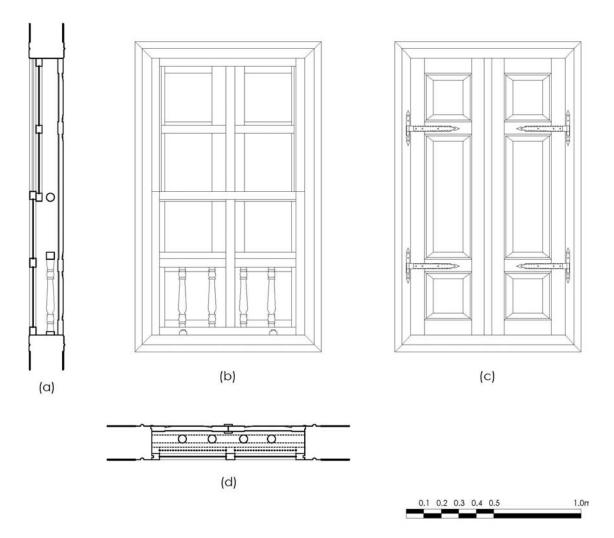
The rectangular window section (a), elevation (b), shutter elevation (c), plan (d)
